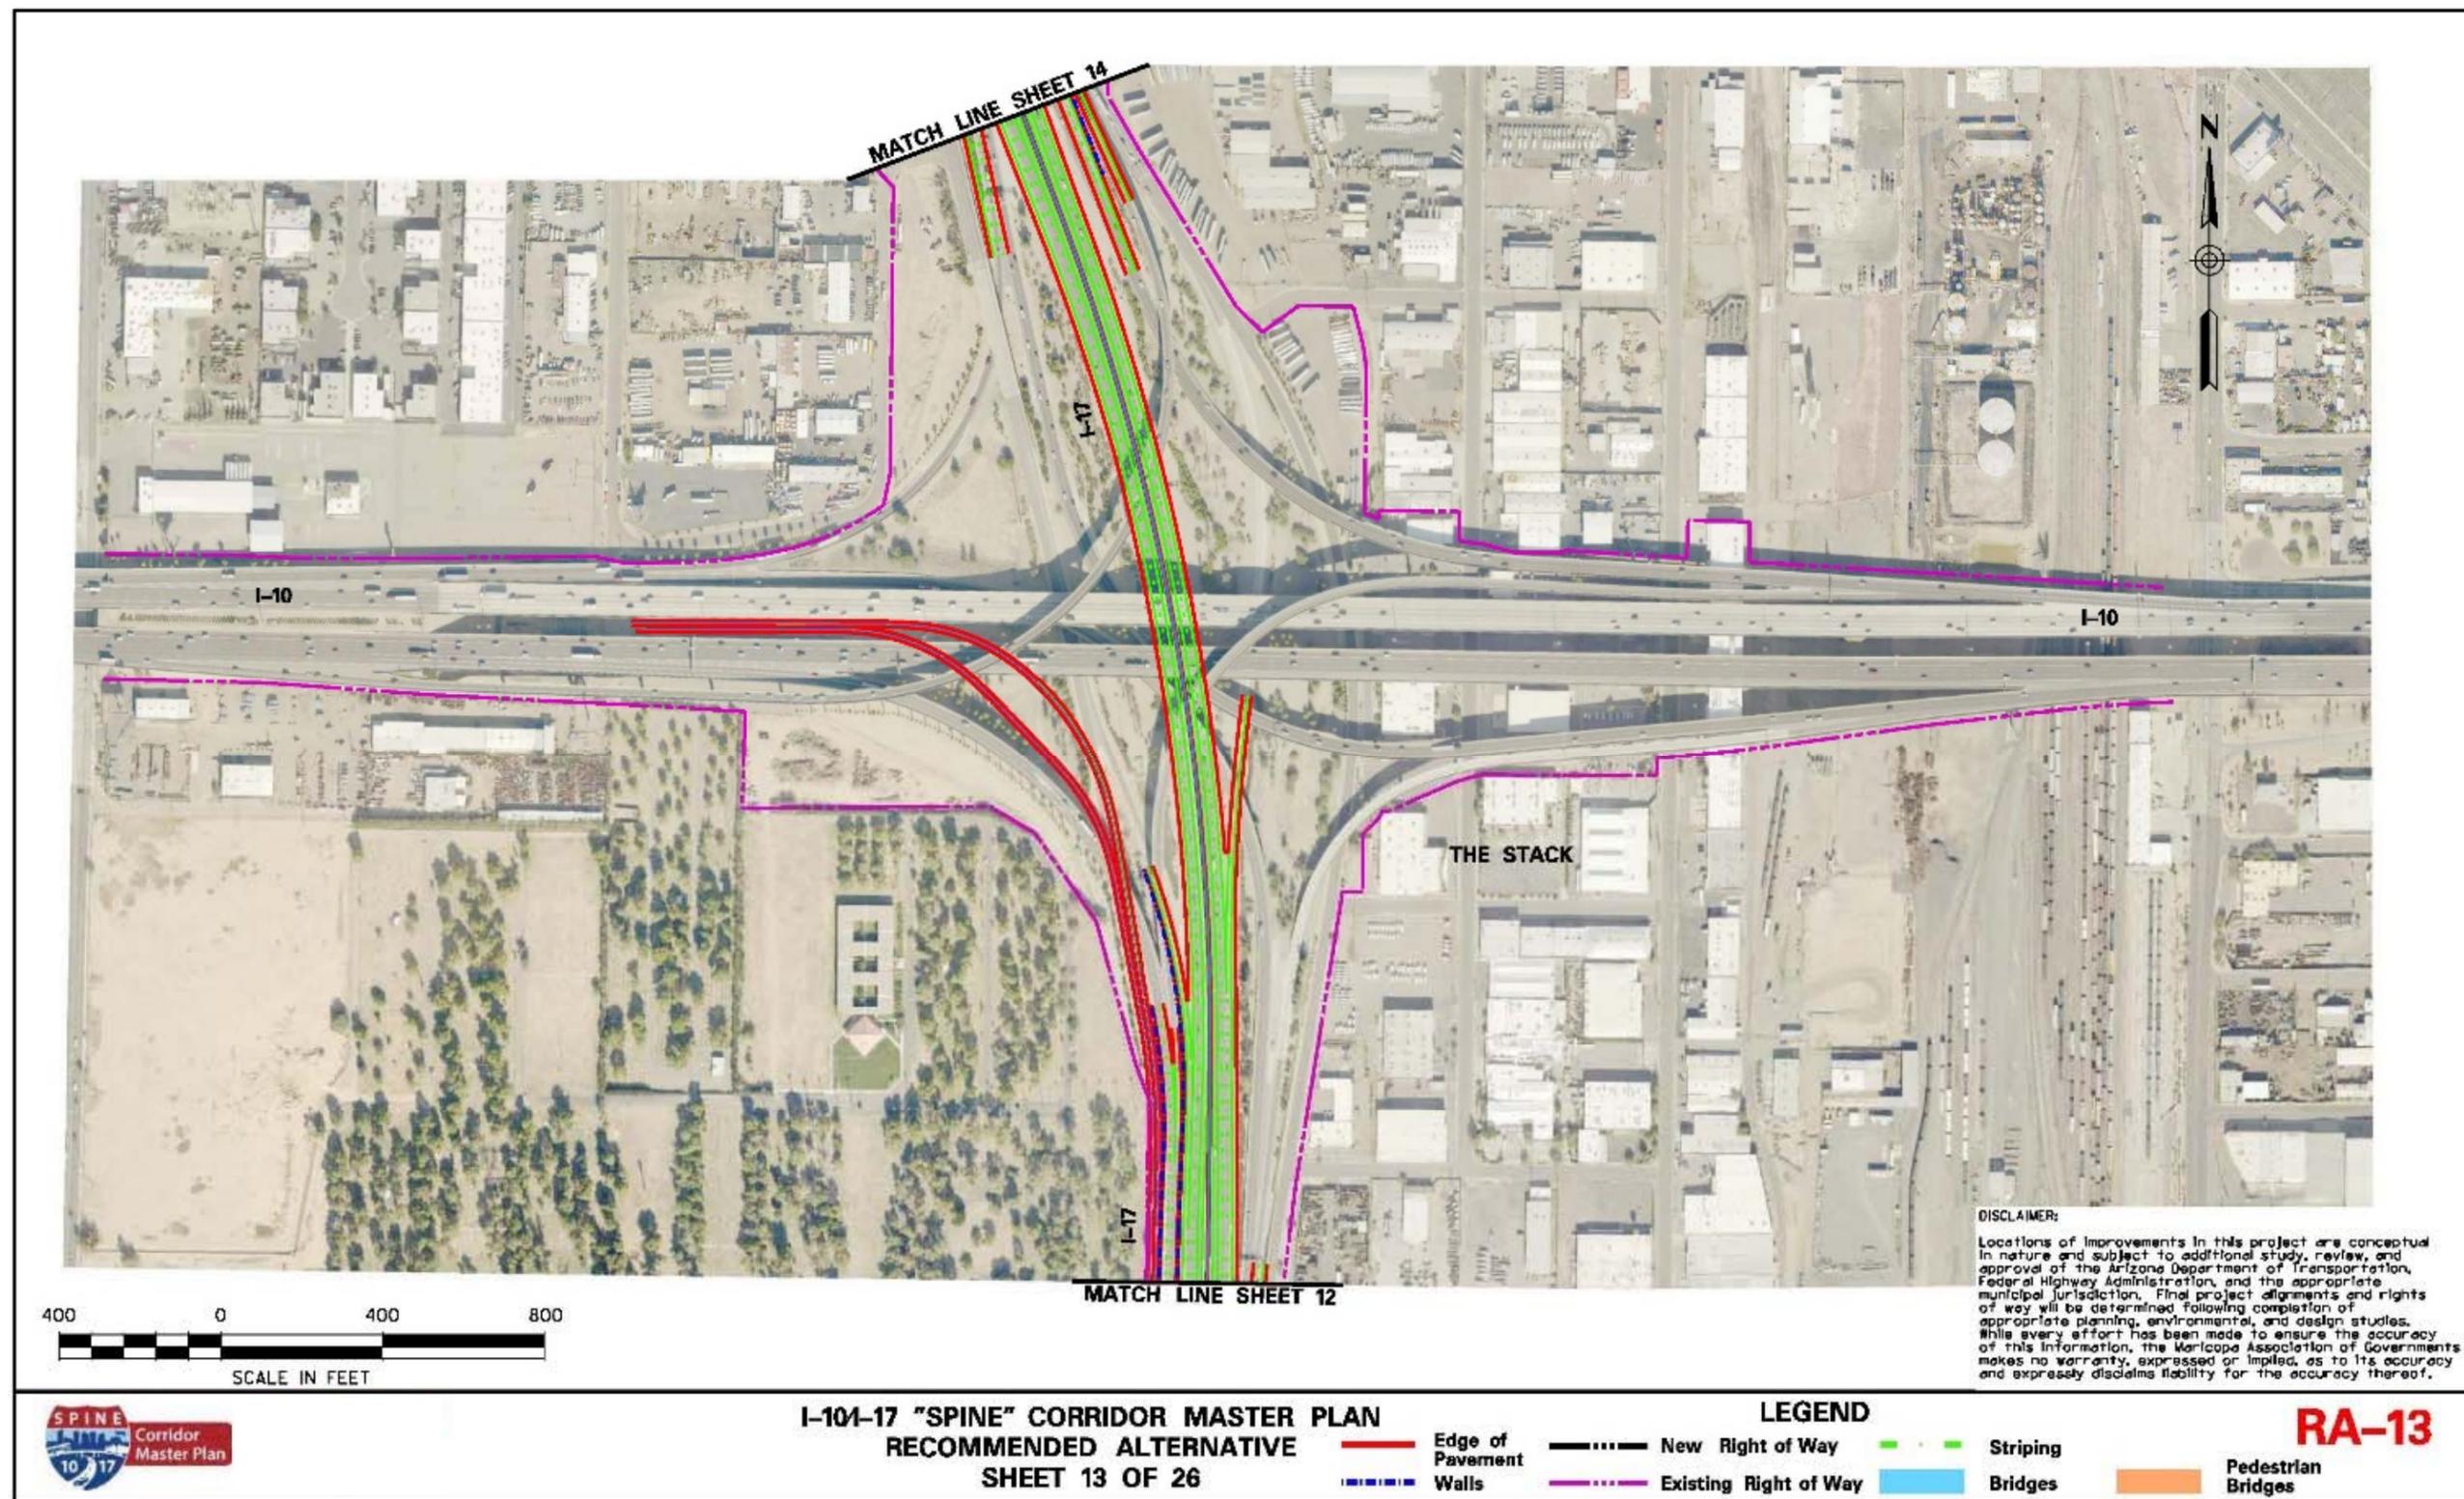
Recommended Alternative, Sheet 13 of 26 (I-17 Segment: I-10 Split to I-10 Stack)
